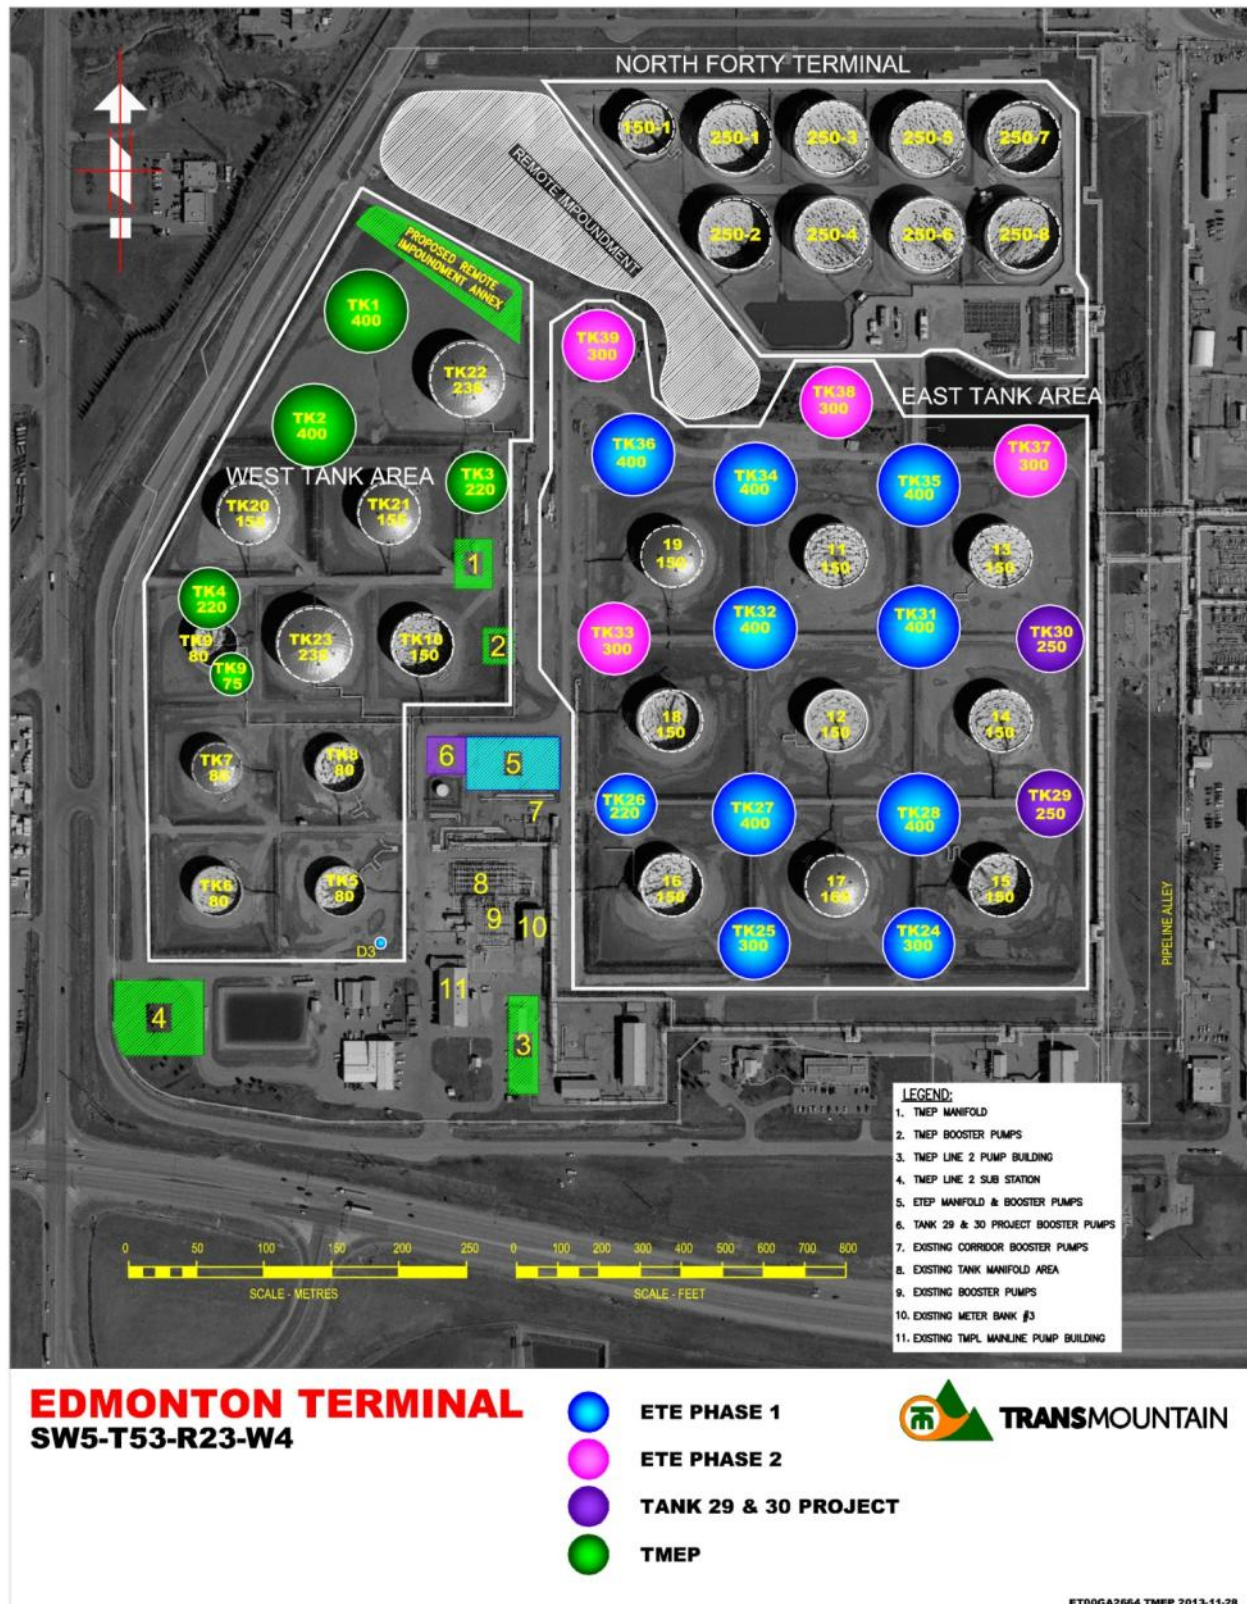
Edmonton Terminal Proposed Plot Plan
